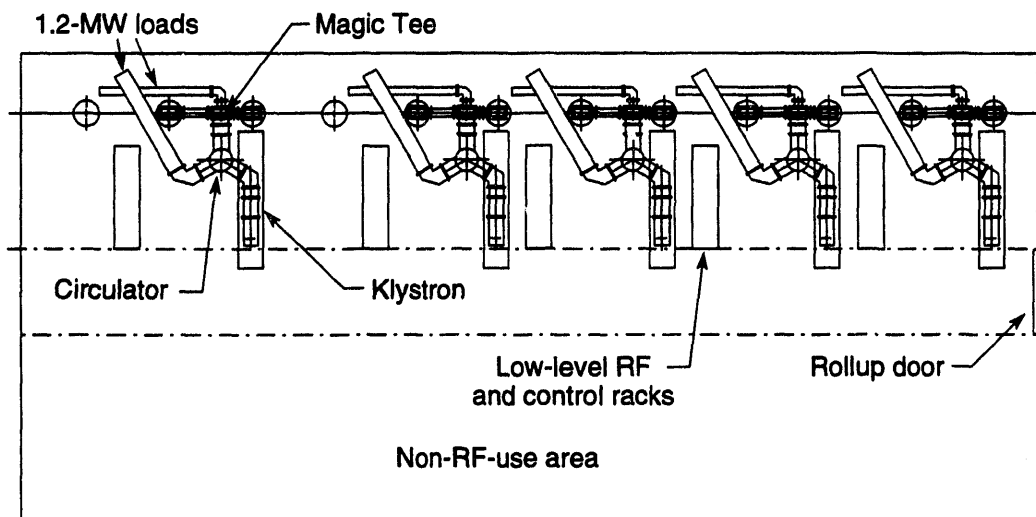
Plan view of an existing RF building, showing the arrangement of five RF stations.
